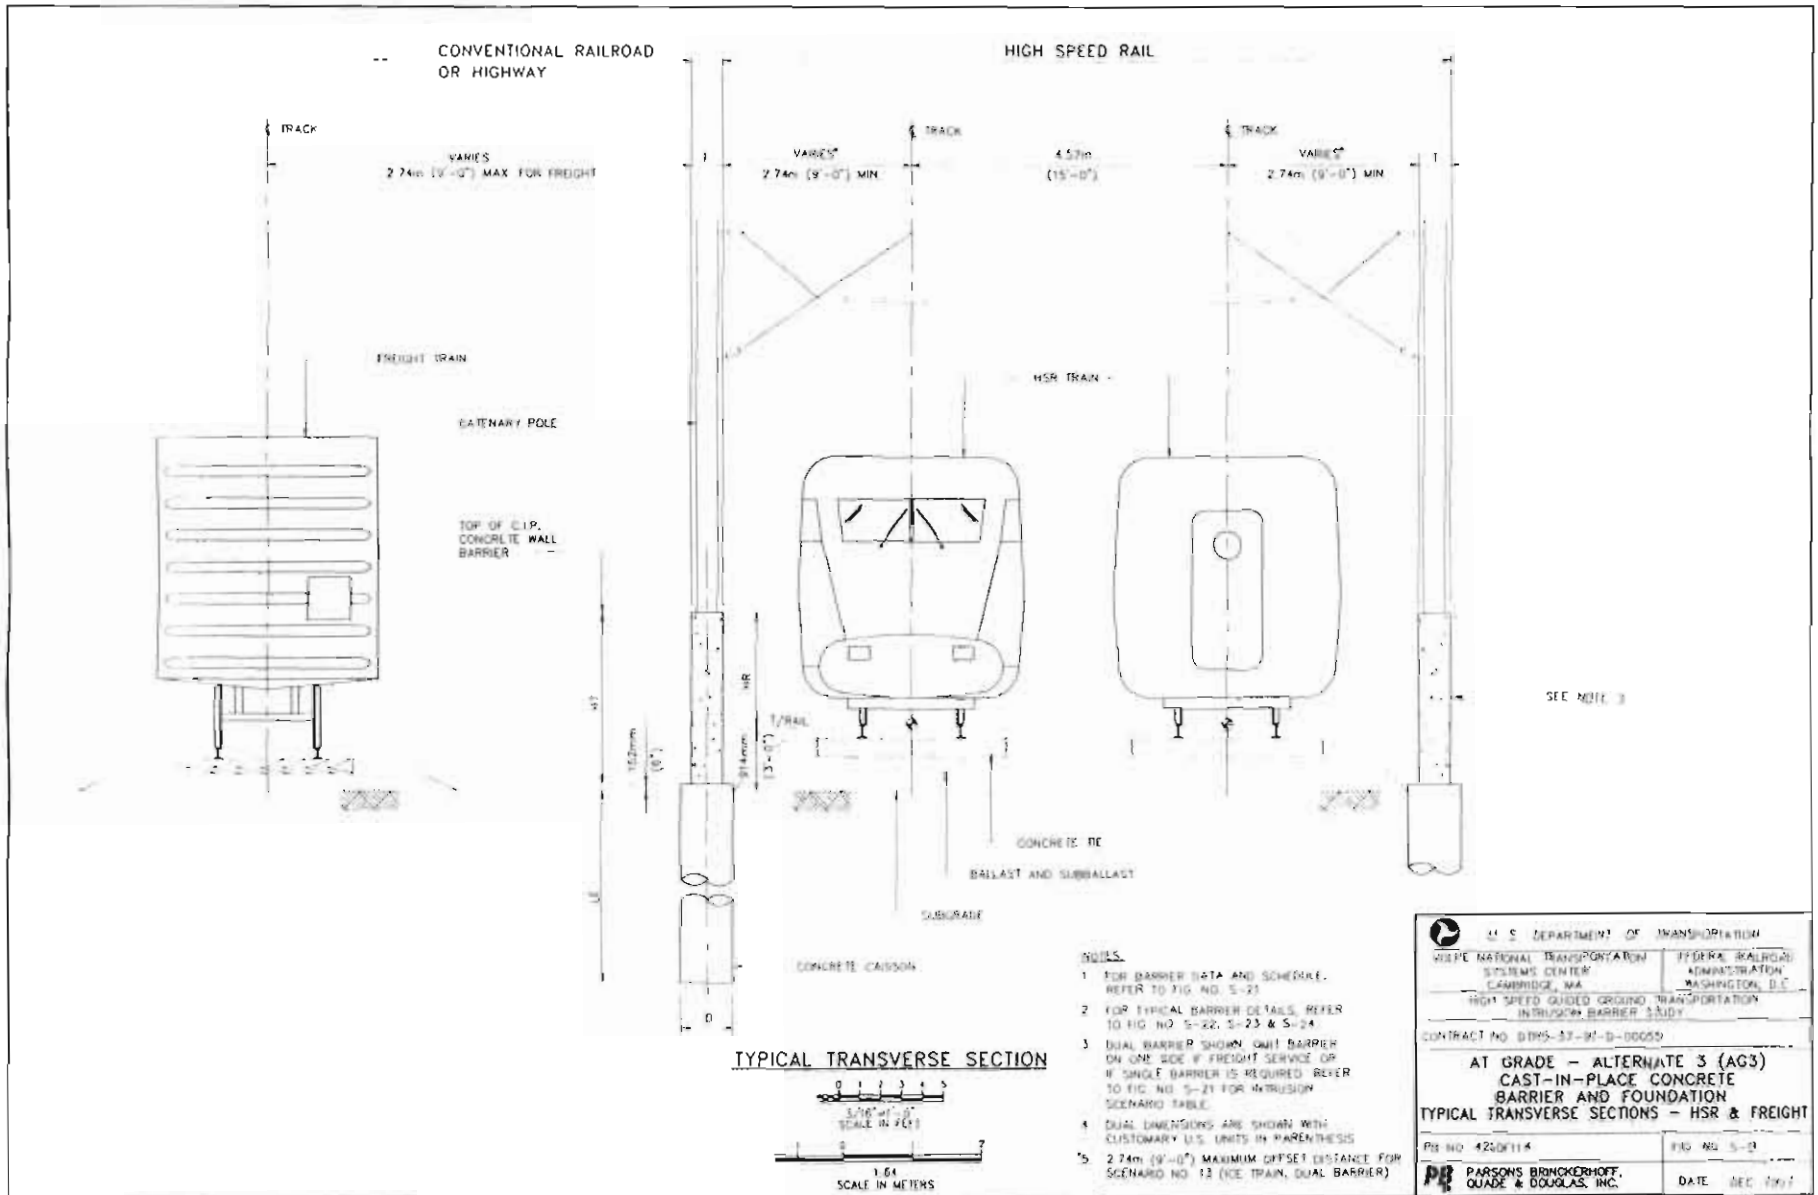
AT GRADE ALTERNATE 3: C.I.P. CONC. WALL AND C.I.P. CONC. FOUNDATION - TRANSVERSE SECTION/RR
